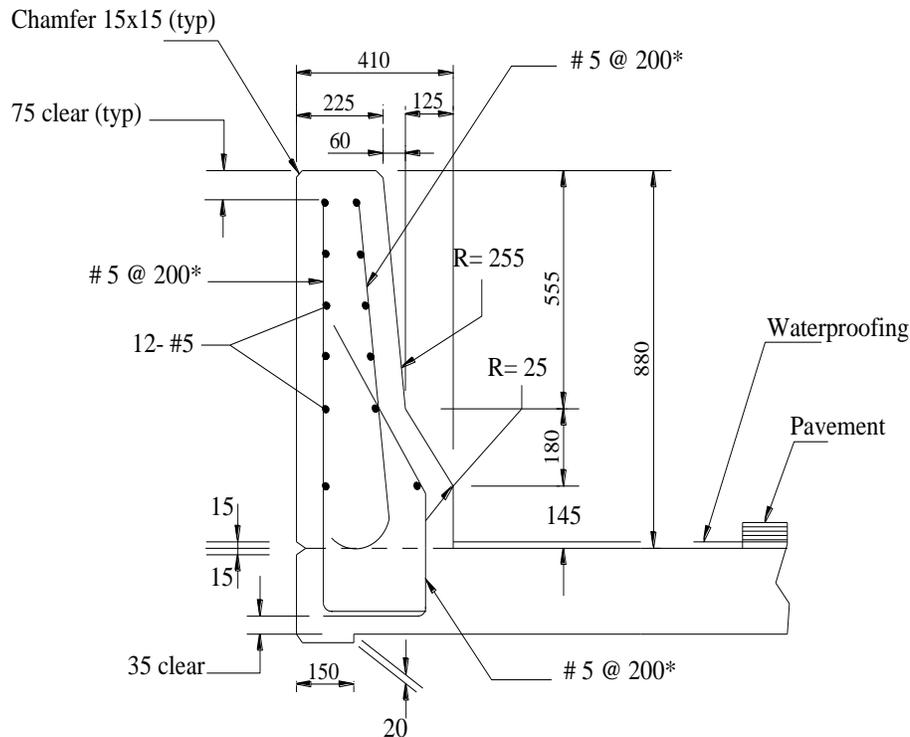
Reinforcement detailing for PL-2 barrier (Reproduced from CAN/CSA-S6-06)
